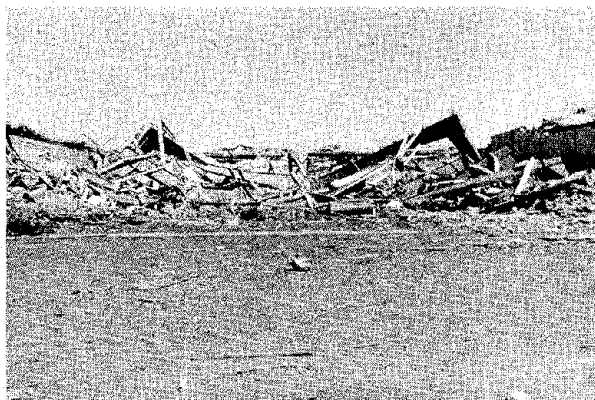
VIEW OF THE DAMAGE IN AREA D LOOKING EAST
